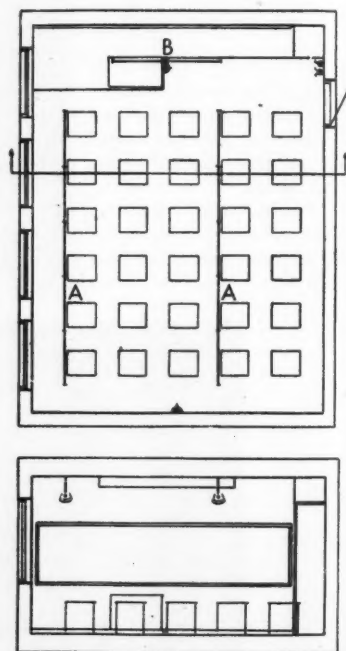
Plan and section of classroom with fluorescent lighting according to Swedish recommendations. The desks are lighted principally from the sides. Fittings are attached directly to the ceiling when this is lower than 3 metres, and in other cases suspended by pendants. (A—room lighting fittings. B—blackboard lighting fitting.)
